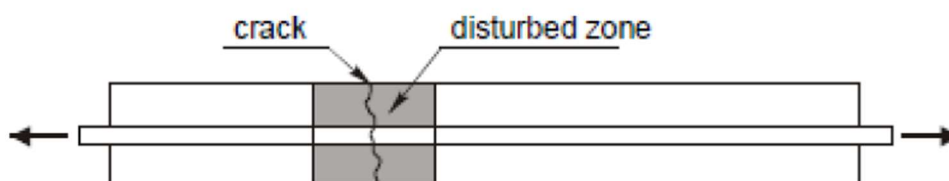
reinforced concrete bar subject to a tensile force (Luković & van der Ham, 2020)
